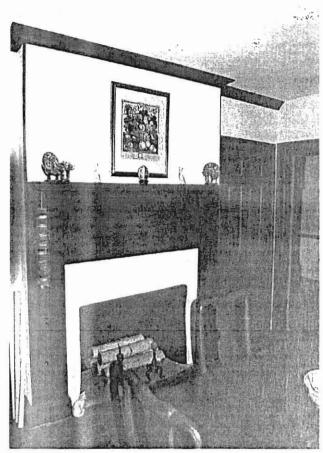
View of the first floor back room (Dining Room) Note how the chair molding wraps around the bottom of the window sill.
